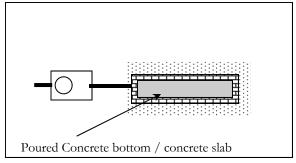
A. (Overhead View) Septic Tank and Brick-Trench System. Trench System constructed onsite with masonry brick/block and mortar. System size, shape and capacity determined according to absorption needs. System utilized for smaller capacity systems in remote areas where excavation and/or heavy equipment cannot be used to install traditional leach areas.
